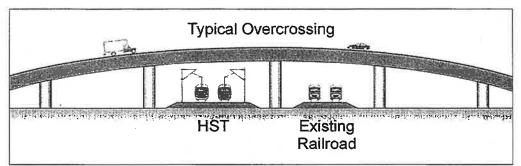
Typical Cross section of a Roadway Overcrossing for both the HST and an Existing Railroad
